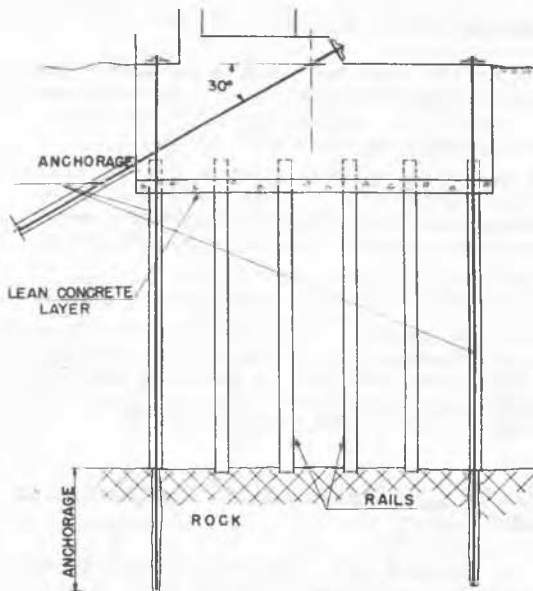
VIADUCT AT "PADRE FEIJÓ" STREET - SALVADOR ANCHORAGES INSTALLED TO SUPPORT THE UPLIFT FORCES AND TO RESIST THE HORIZONTAL LOADS ON THE ABUTMENT
